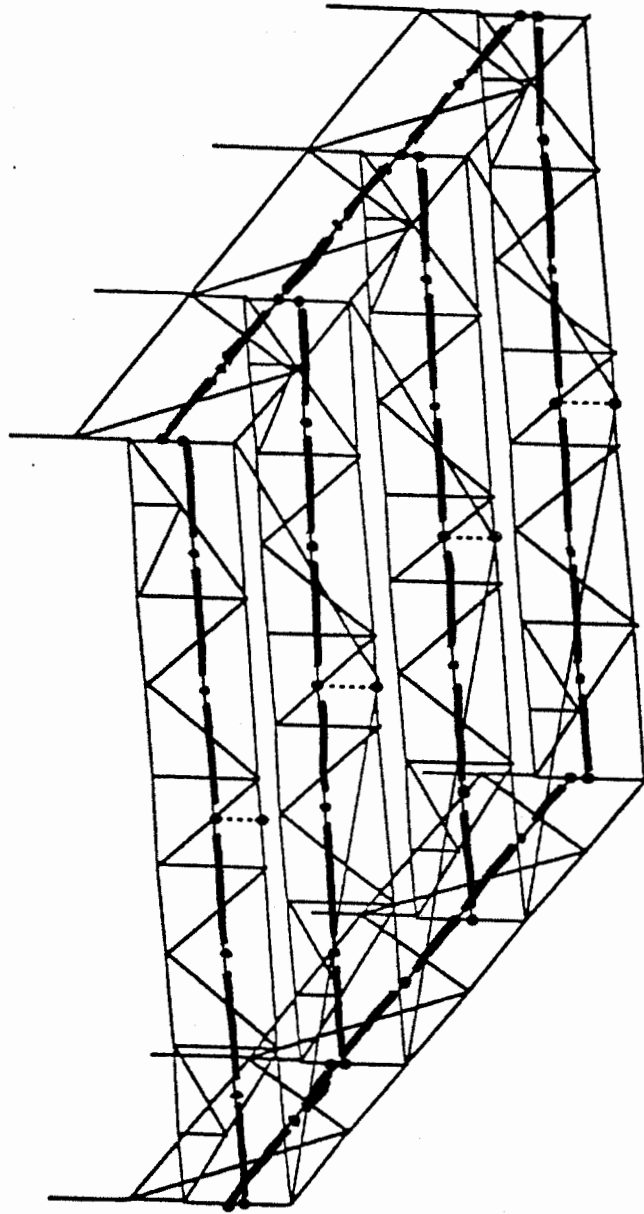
Idealization of the Superstructure Stiffening Truss System
